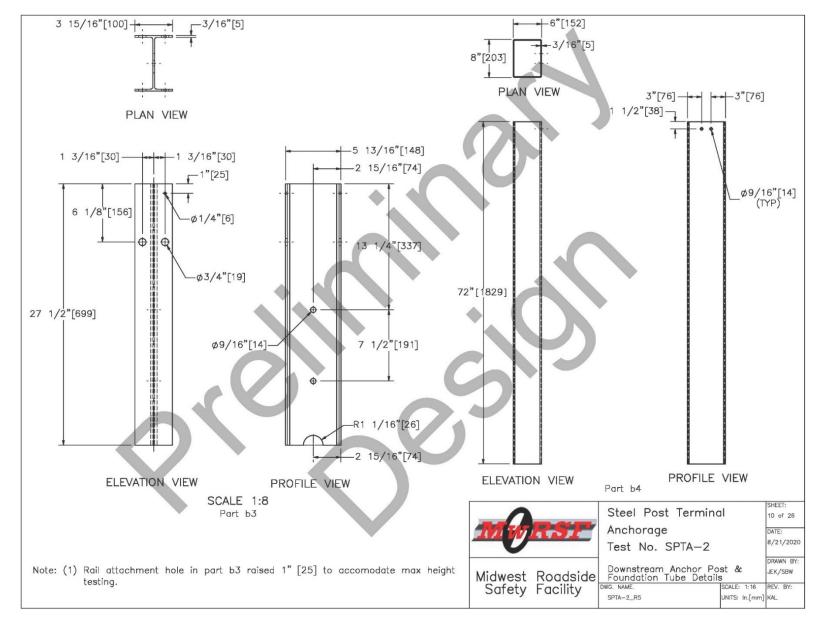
Downstream Anchor Post and Foundation Tube Details, Test No. SPTA-2
